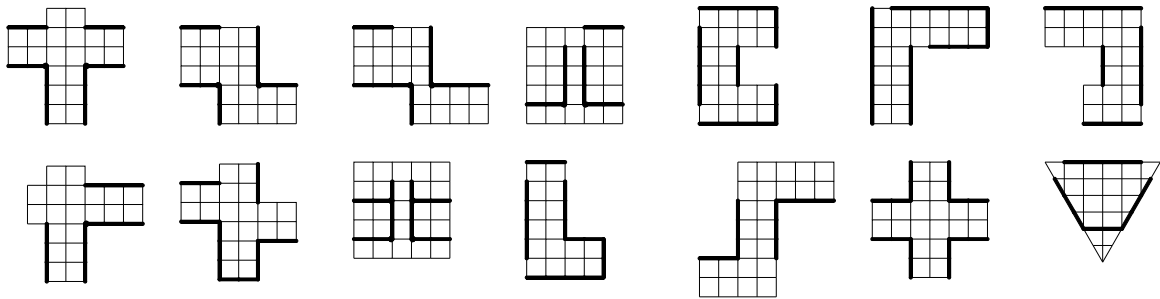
Building layouts considered; moment resisting frames are highlighted.
